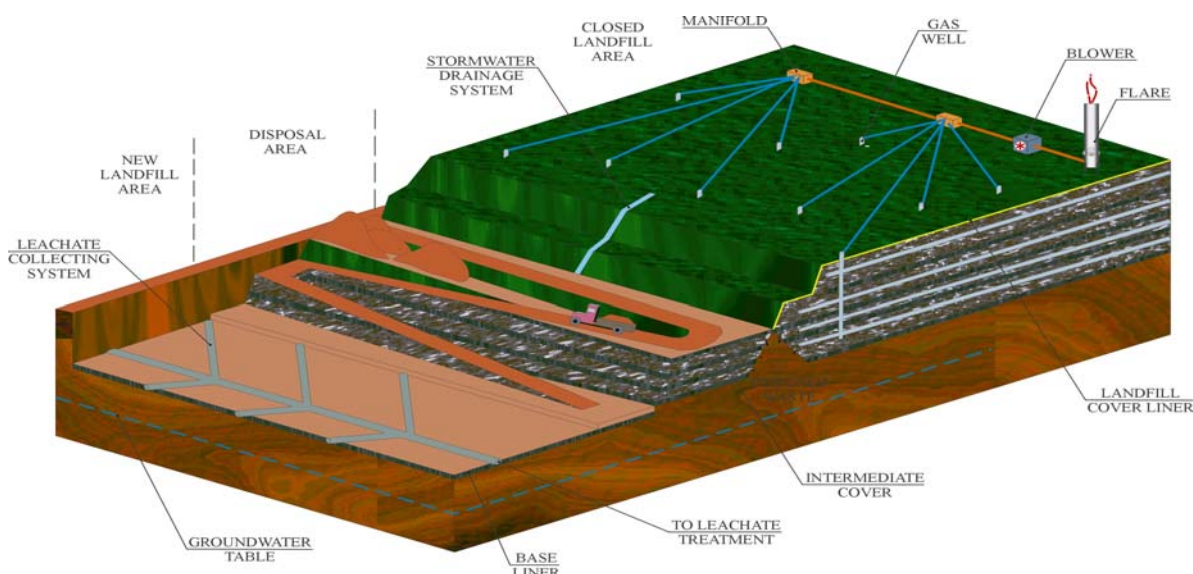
Sectional drawing of a landfill with gas collection / flaring system
